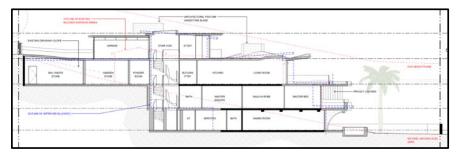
Section plan of the development showing the existing floors and walls in black and new floors and walls in grey
